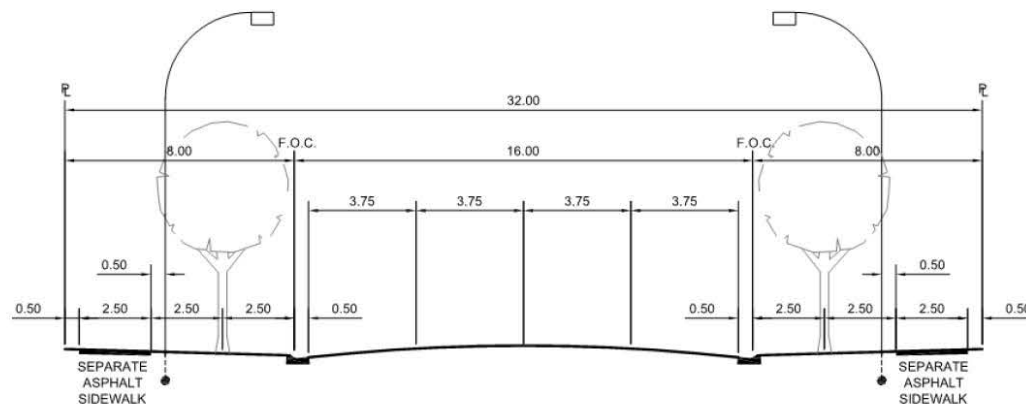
Typical 32 m Undivided Arterial Cross Section
